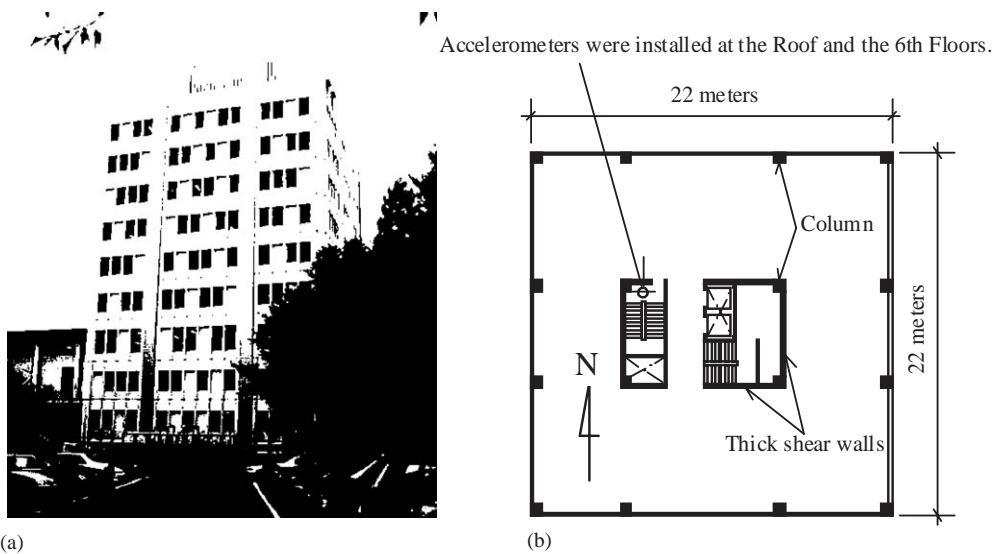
A steel reinforced concrete building: (a) overviews; (b) plan and sensor location.
